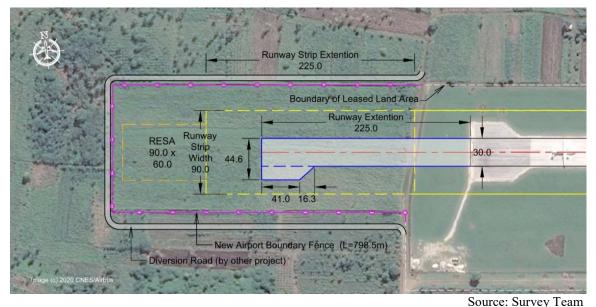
Layout Plan of Runway Extension toward West at VAV
